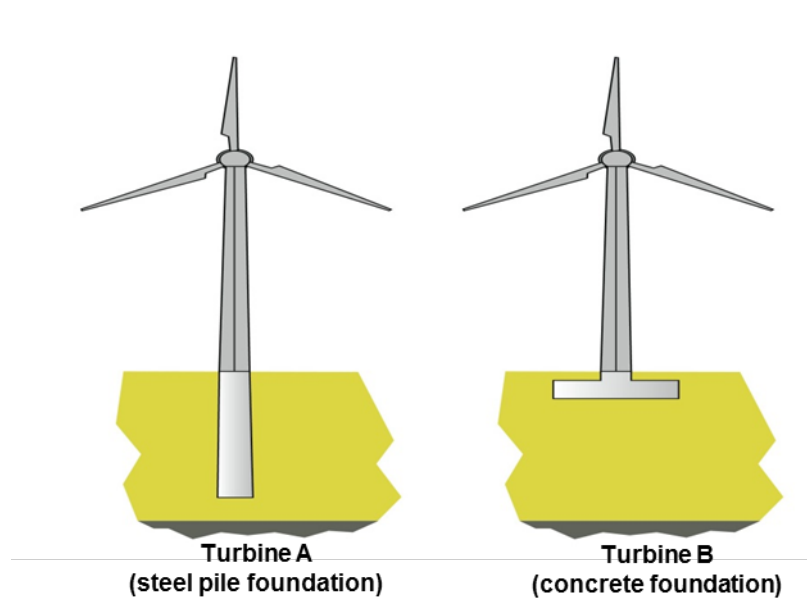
Types of foundation for wind turbine system (steel pile and concrete foundation)
